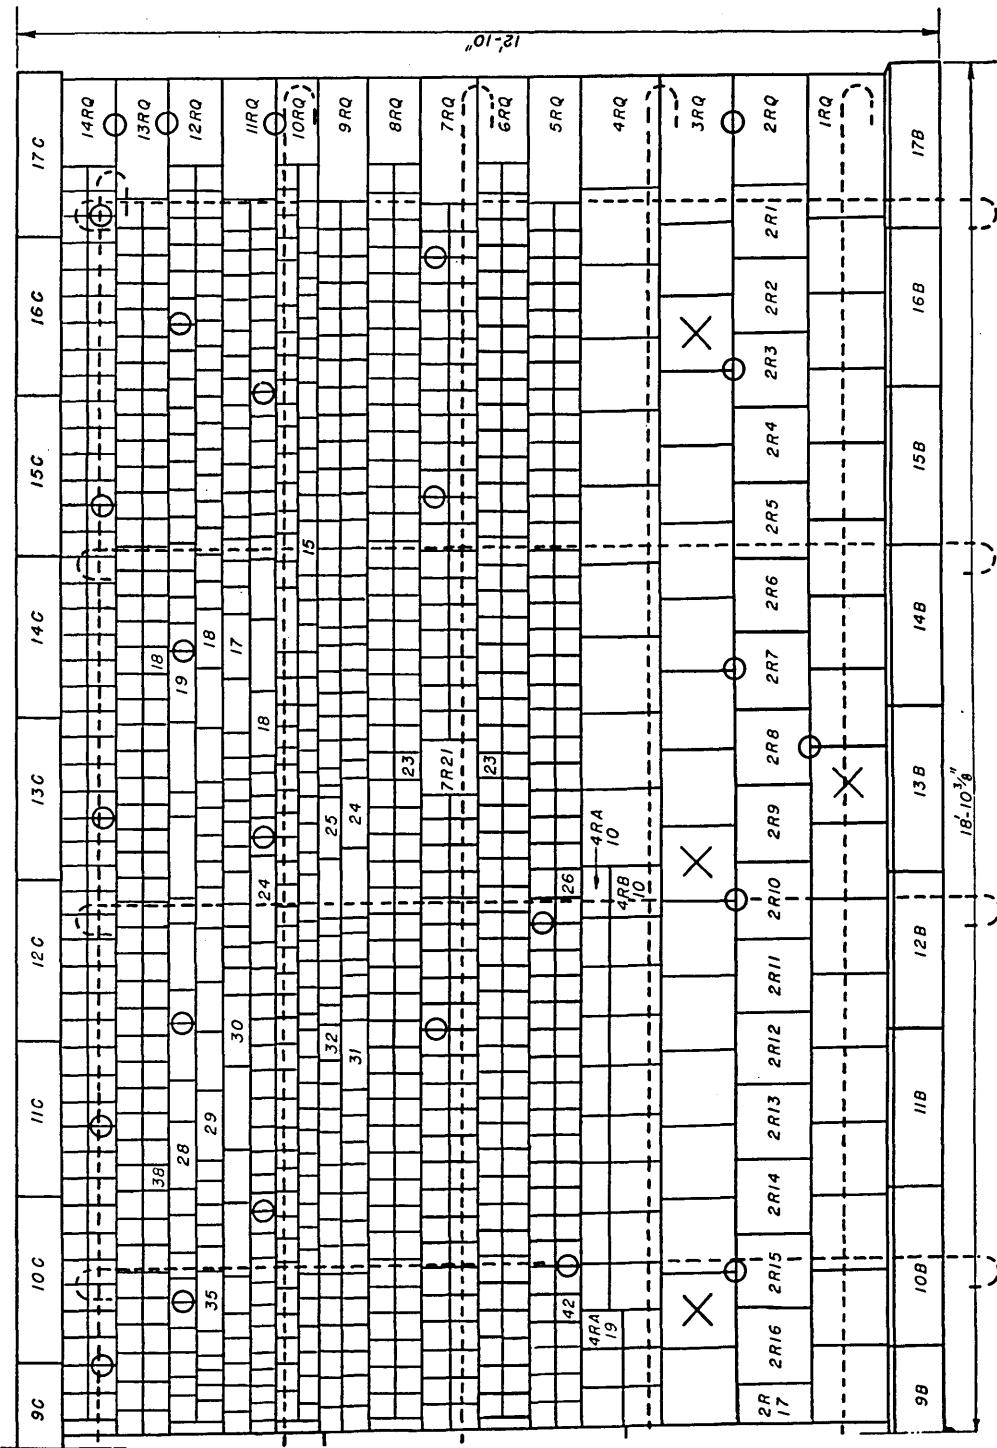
Continued. Structural details of stone exposure test wall.
